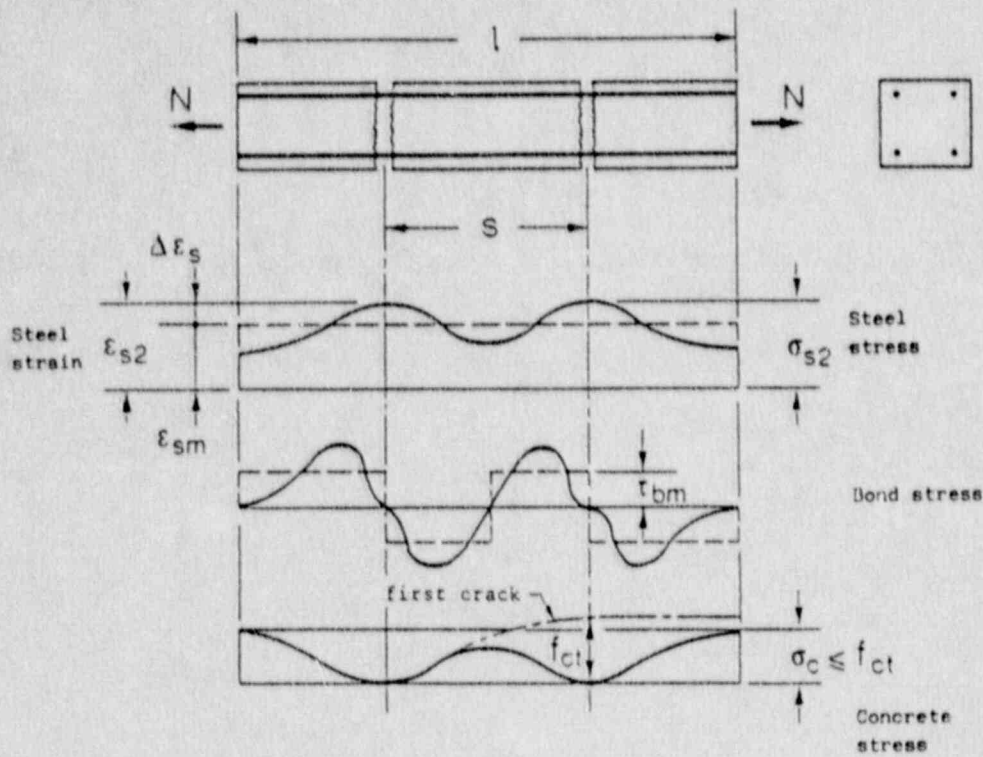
Cracking Mechanism in a Reinforced Concrete Member Subject to Tension
